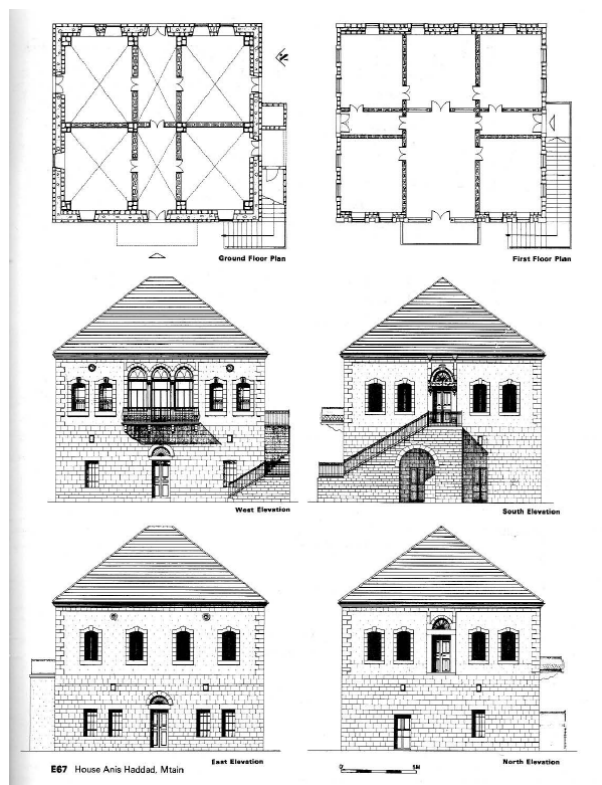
A "typical" Lebanese Central Hall house (Ragette 1974, 99)
